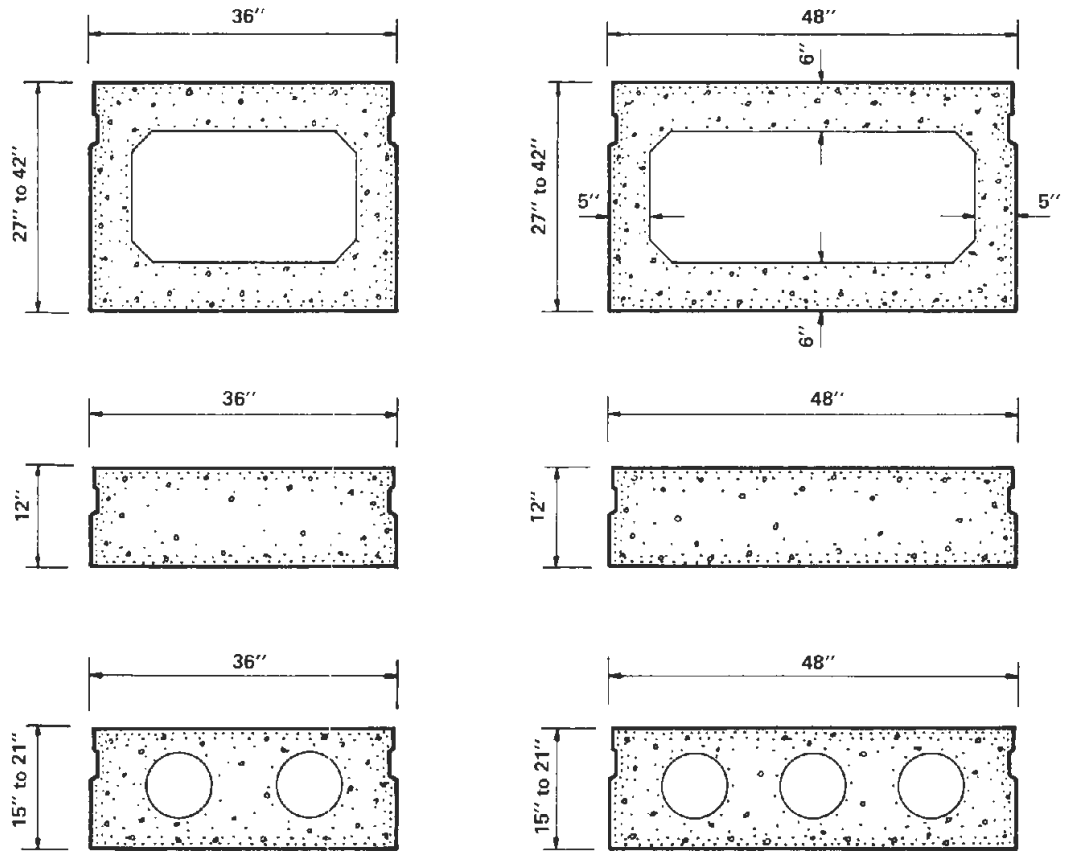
AASHTO-PCI standard box beams and bridge slabs.
